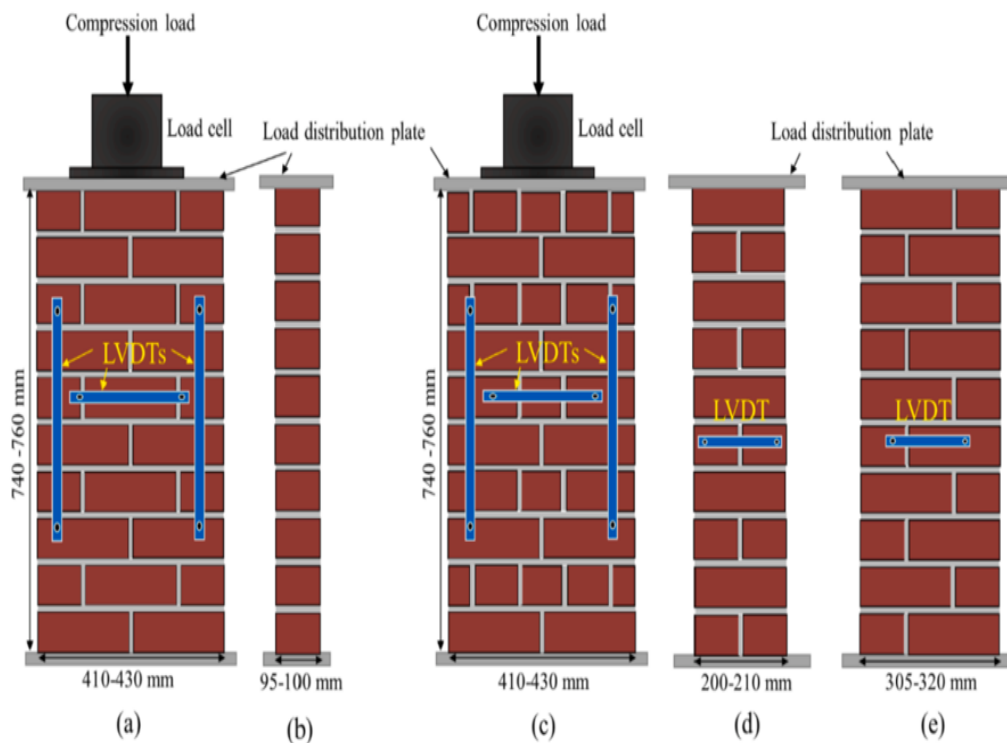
Compressive testing set-up (a) View of a single brick specimen from the front (b) View of a single brick specimen from the side (c) View of a single and double brick specimen from the front (d) View of a double brick specimen from the side (e) View of a triple brick specimen from the side [31].
